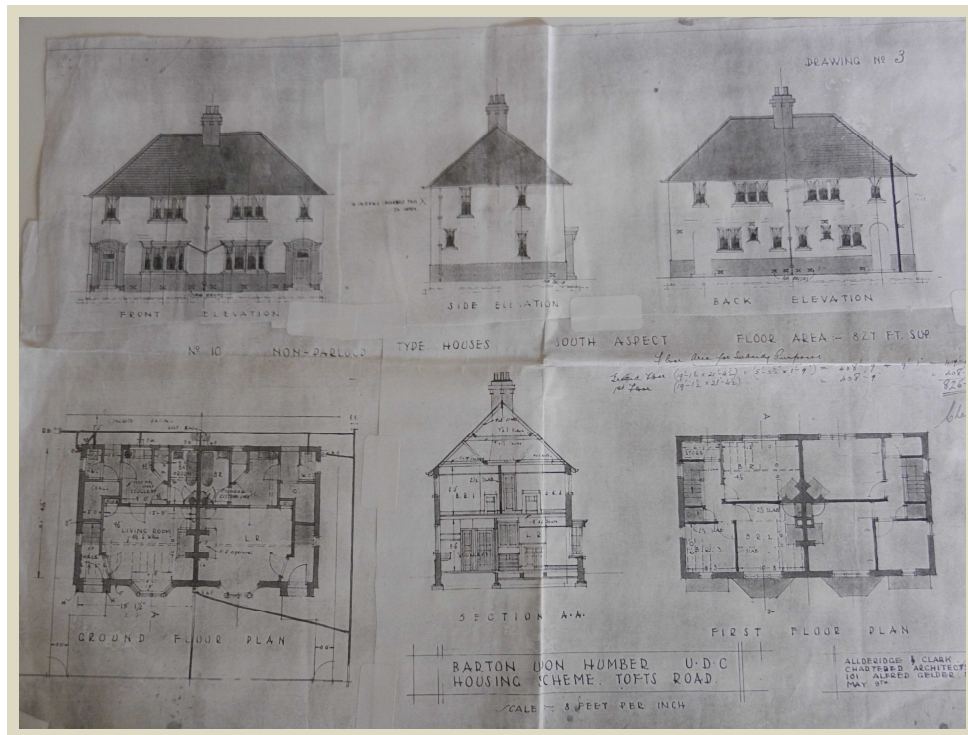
Plans and elevations for the 'south aspect' houses – 'Front elevation', 'Side elevation', 'Back elevation', 'Ground floor plan', 'Side plan' and 'First floor plan'.
